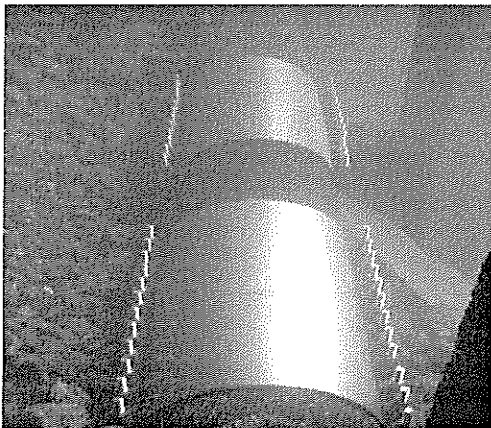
New 60" spool piece with (2) new stainless 30" long pipe clamps 2/3 from west end of CCS dock
